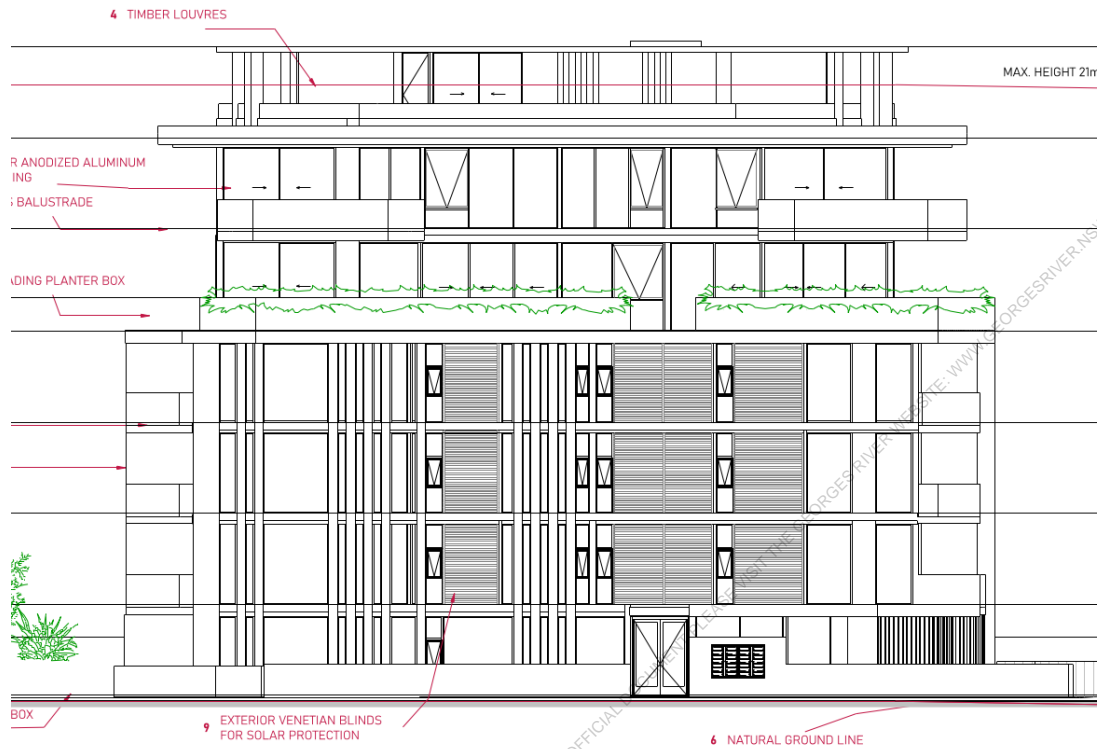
Elevation plan (Park Road (southwest) elevation)
